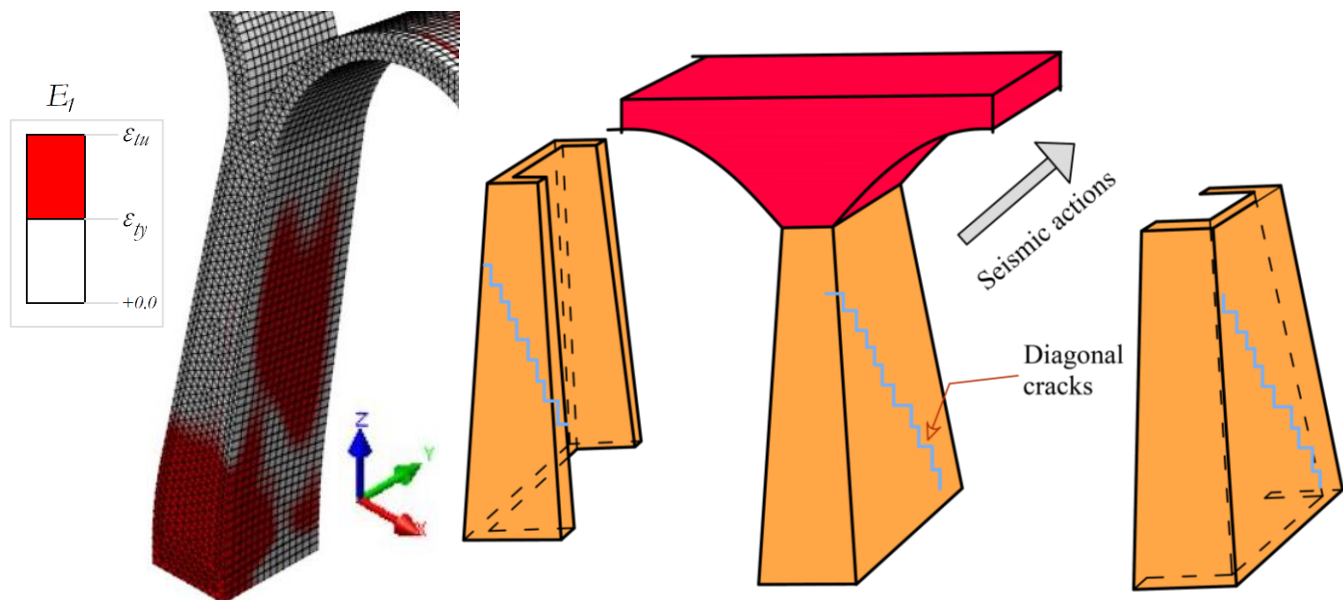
Model with  $D^*/D=0.118$ , pushover analysis in Y, crack contour in the longitudinal section of the bridge. b) Collapse mechanism of the pier
